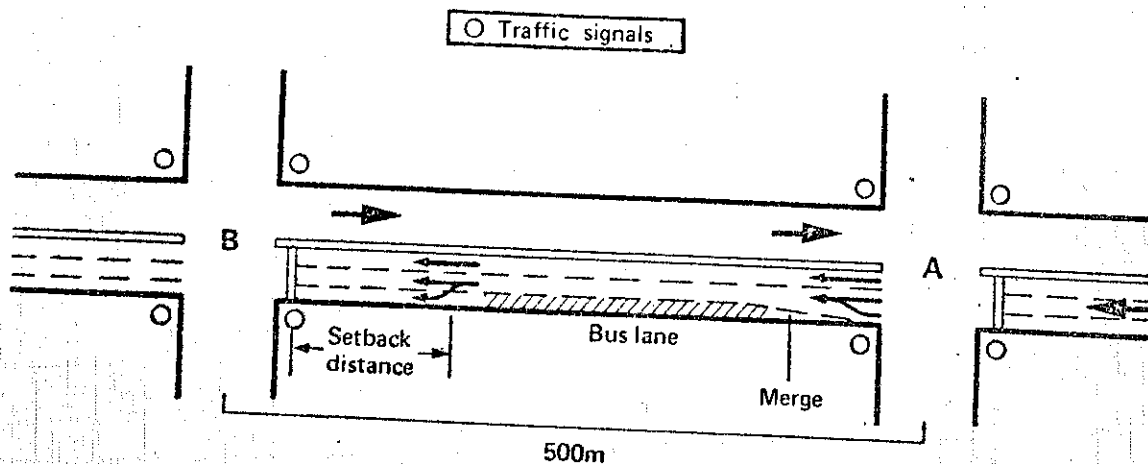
Layout of road link modelled at TRRL (source: ref. 55)
